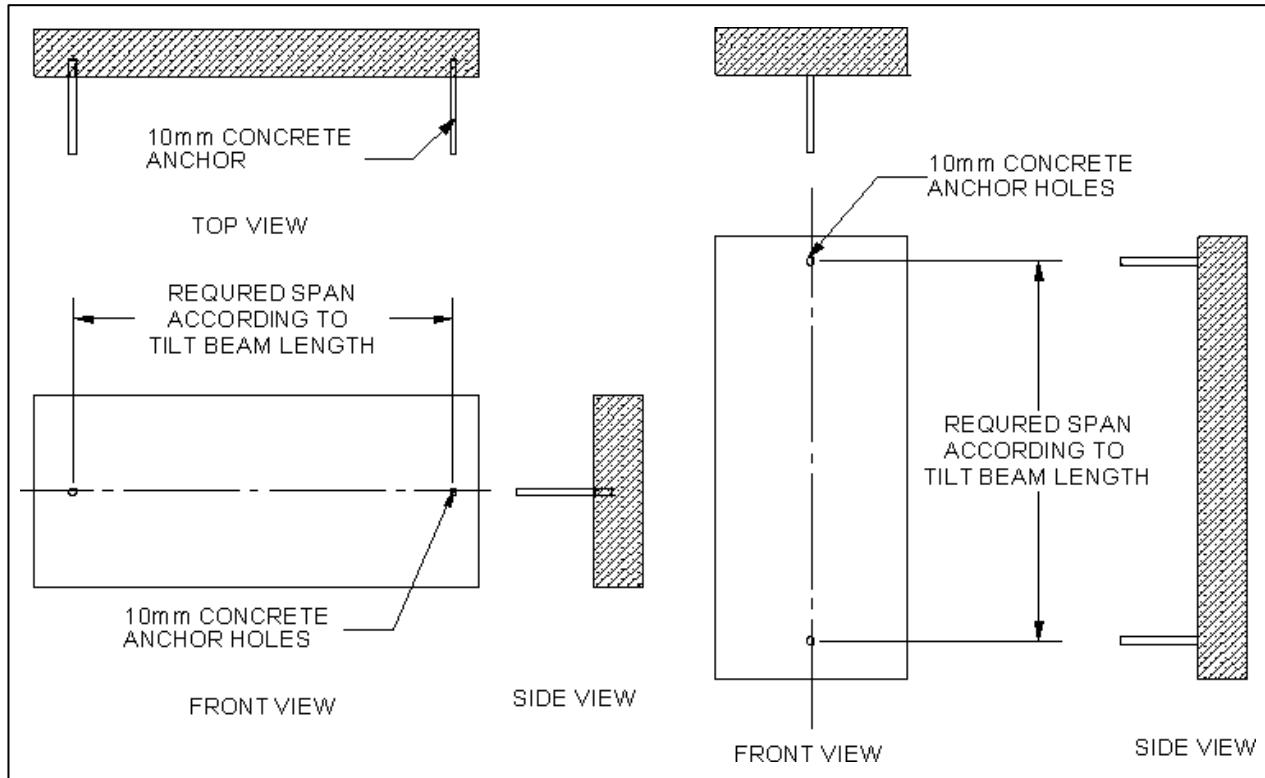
MEMS Tilt Beam Horizontal and Vertical Concrete Anchor Orientation
